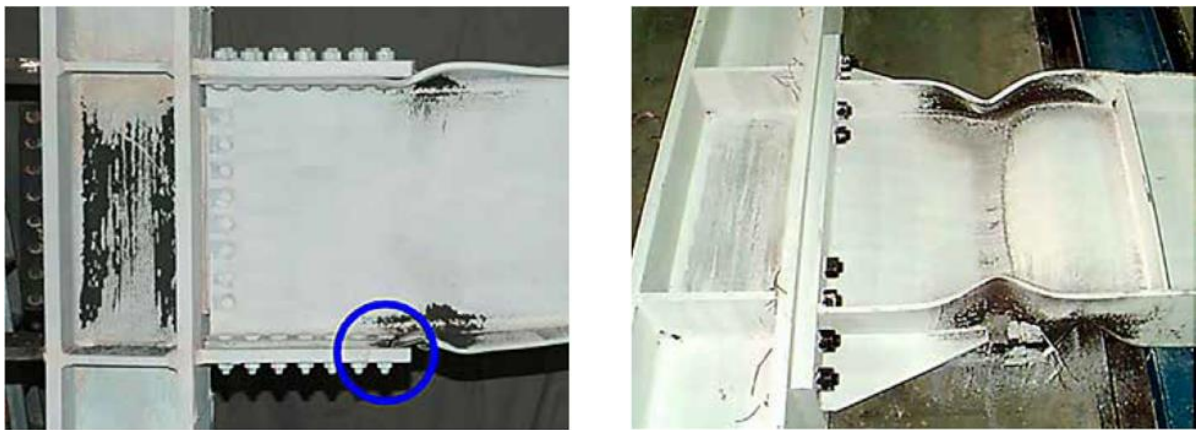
Fracture of beam flange plate of a moment connection (Sato, Newell and Uang, UCSD SSRP-2007) (Left); End plate specimen at failure (Sumner et al., 2000) (Right)
